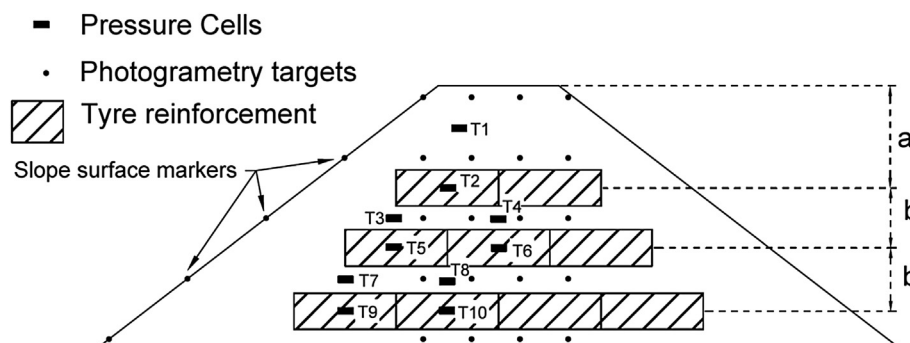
Elevation profile with the details of the reinforcement layouts tested and the location of the instrumentation.
